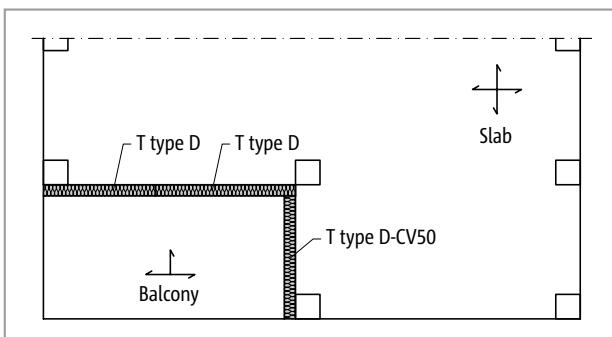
Schöck Isokorb® T type D: Two-way spanning
